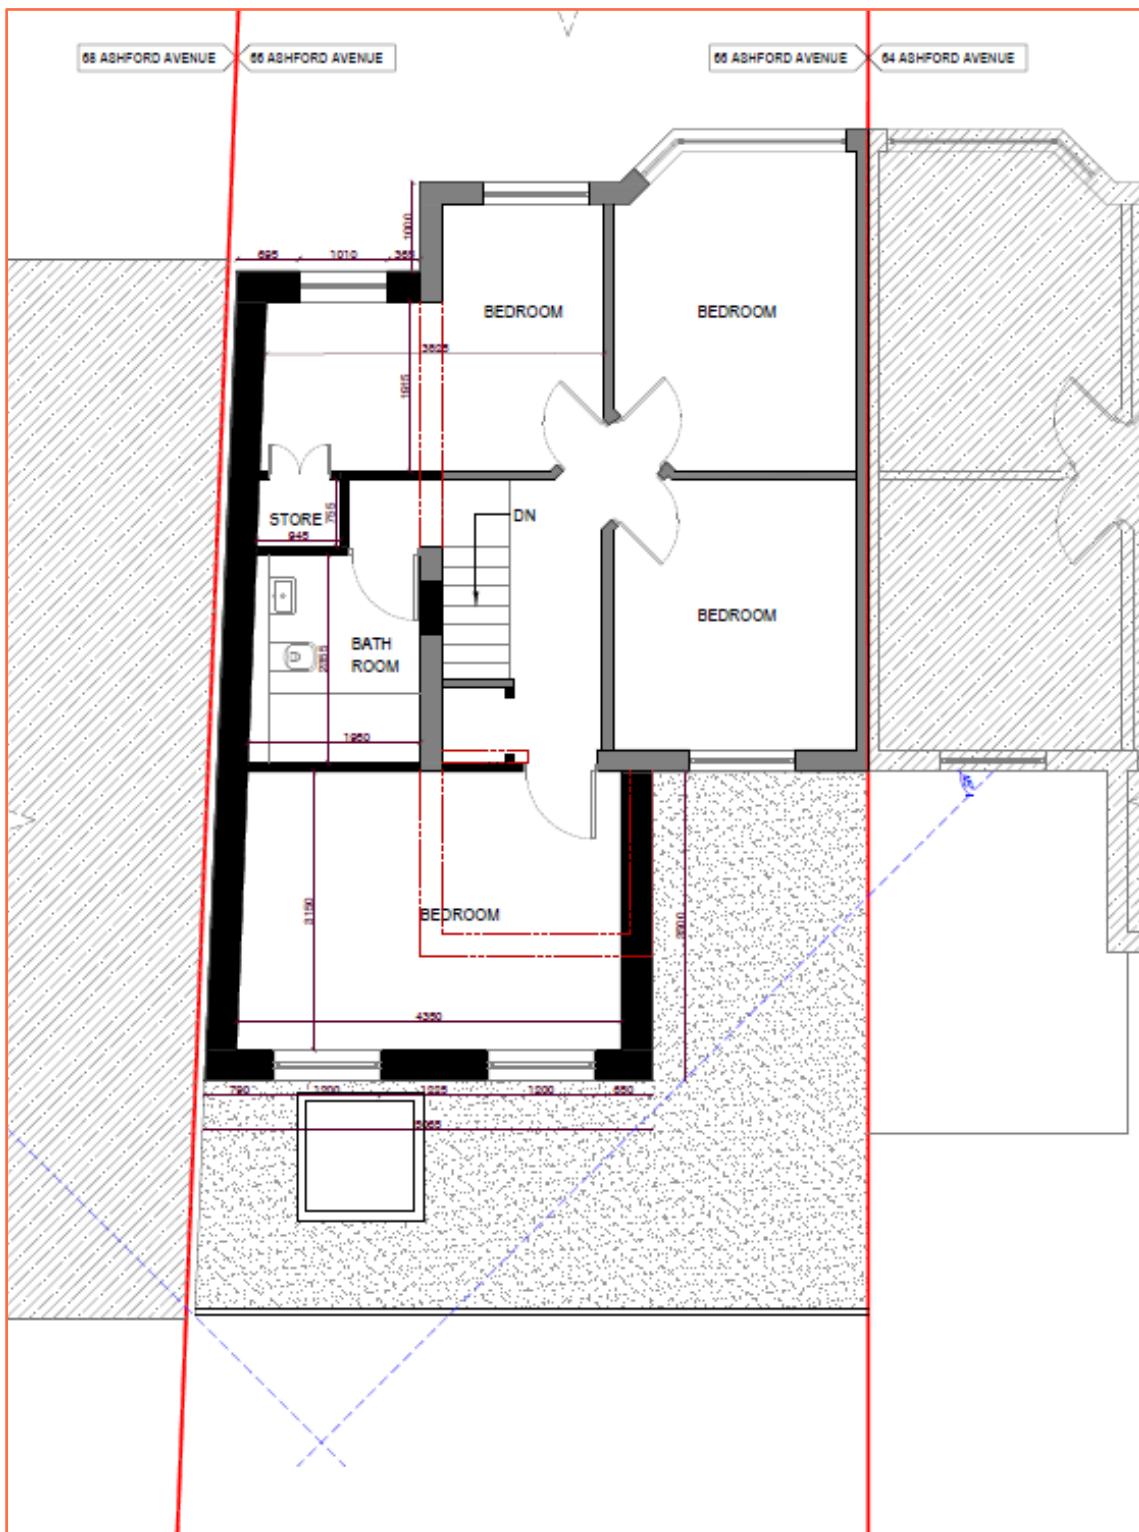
Proposed first floor for wrap around extension (Source: AMBA Architecture)
